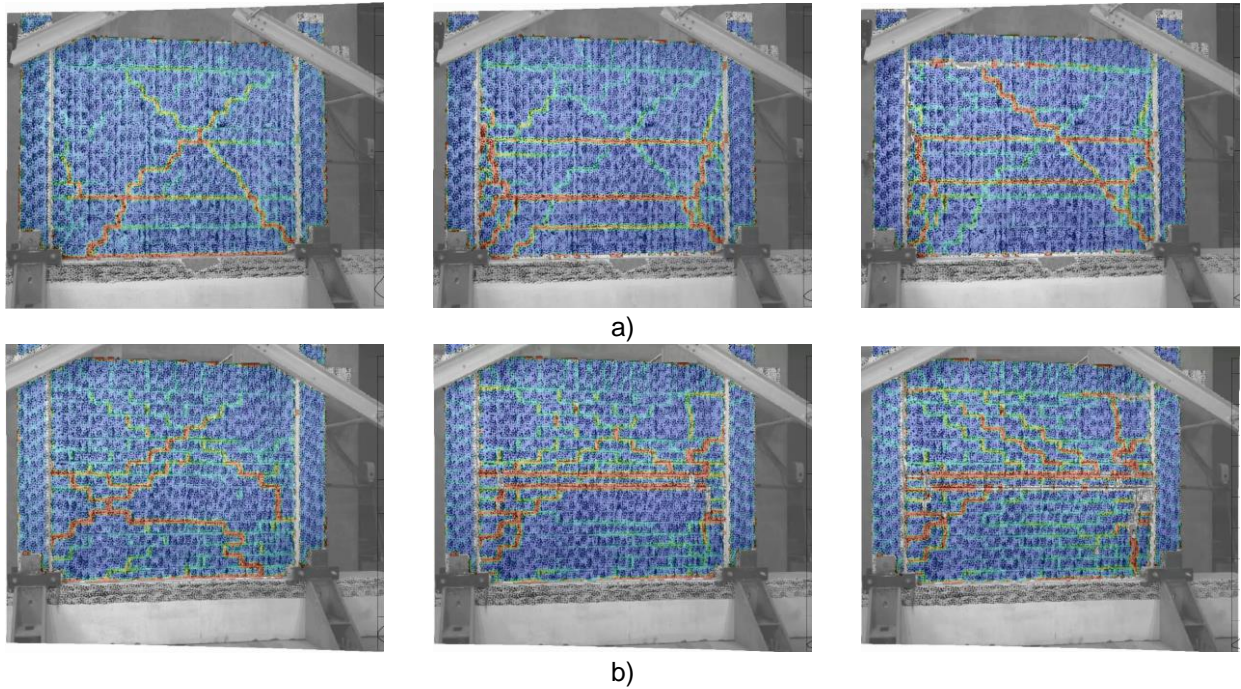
Damage progression on masonry infill walls during OoP shear push-out tests presented by Von Mises strains recorded by ARAMIS: a) clay block, and b) clay brick masonry infill wall with tie anchors
